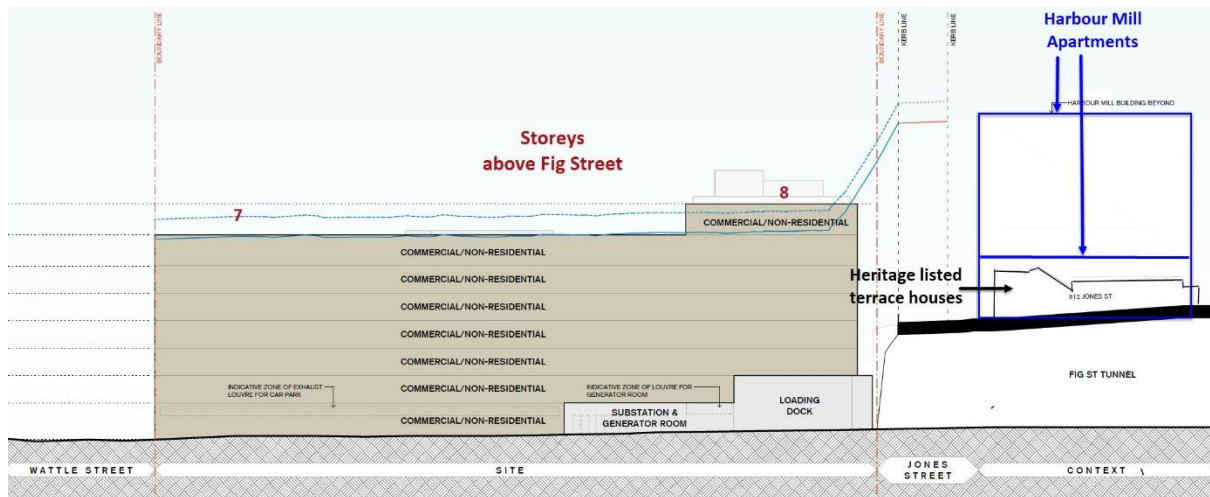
Proposed Storeys: Indicative Reference Scheme - Fig Street Elevation
